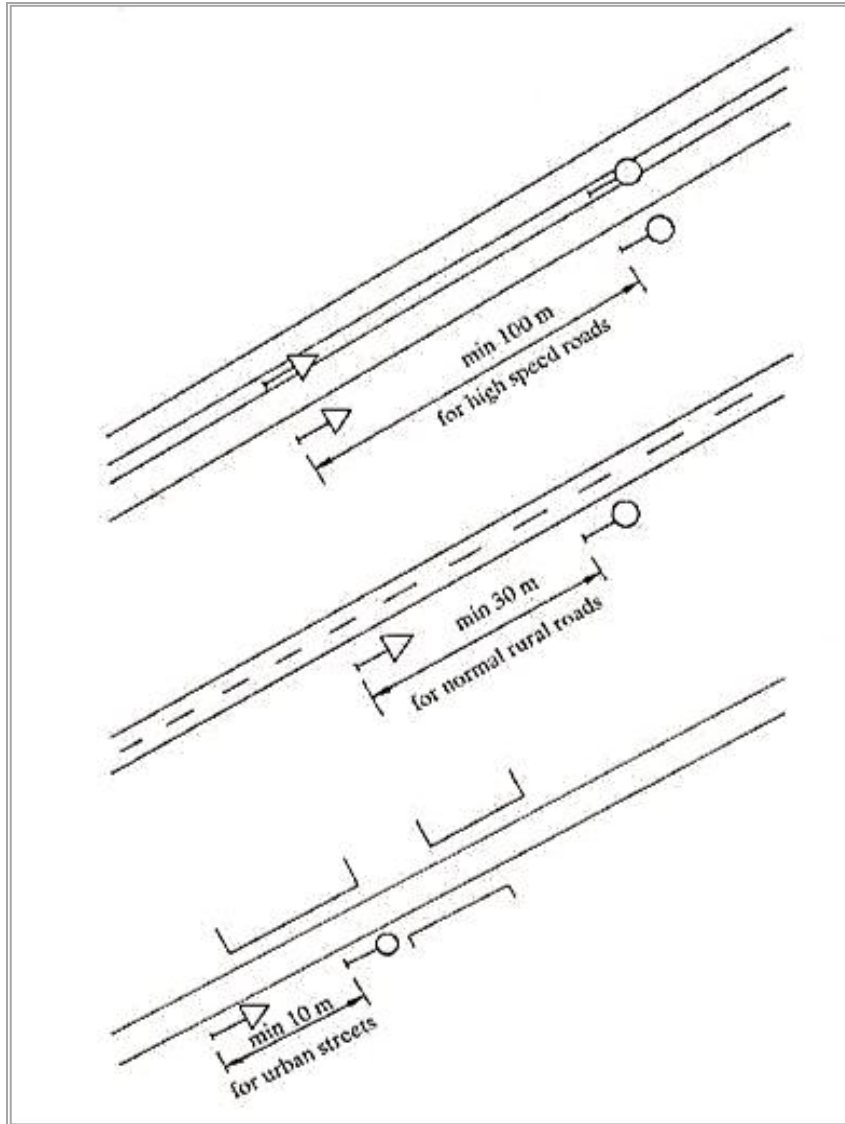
/4: Minimum Spacing of Traffic Signs [4, p. IV-4]
